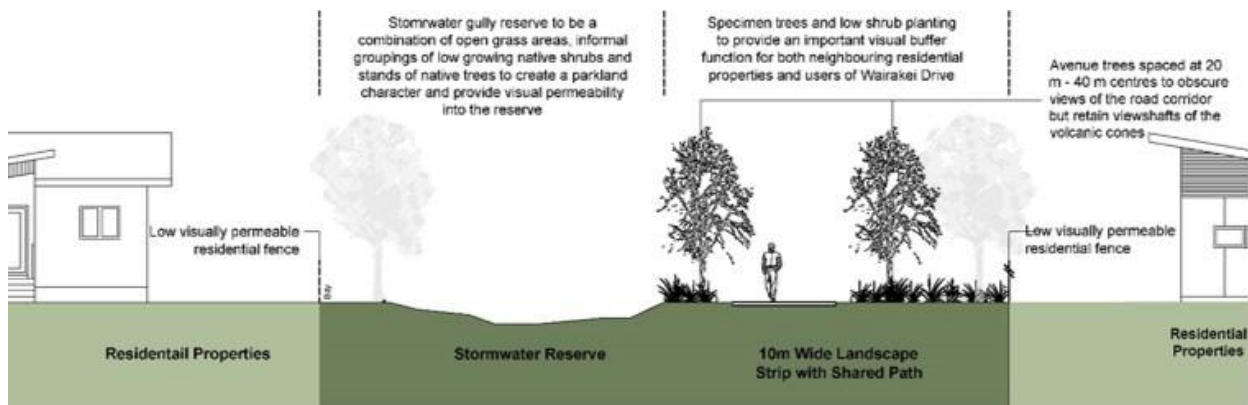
B: Cross section illustrating the Stormwater Reserve frontage
